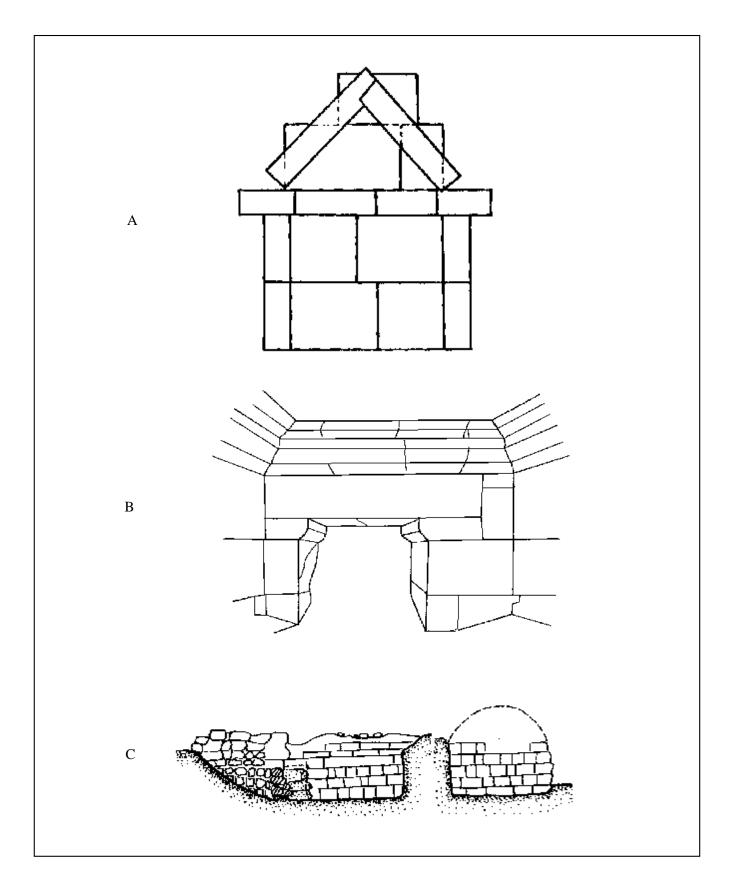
A - crypt with two-slope floors (excavation 1920); B - crypt with corbelling floors (excavation 1844); C - crypt with semicircular floors (excavation 1907).
